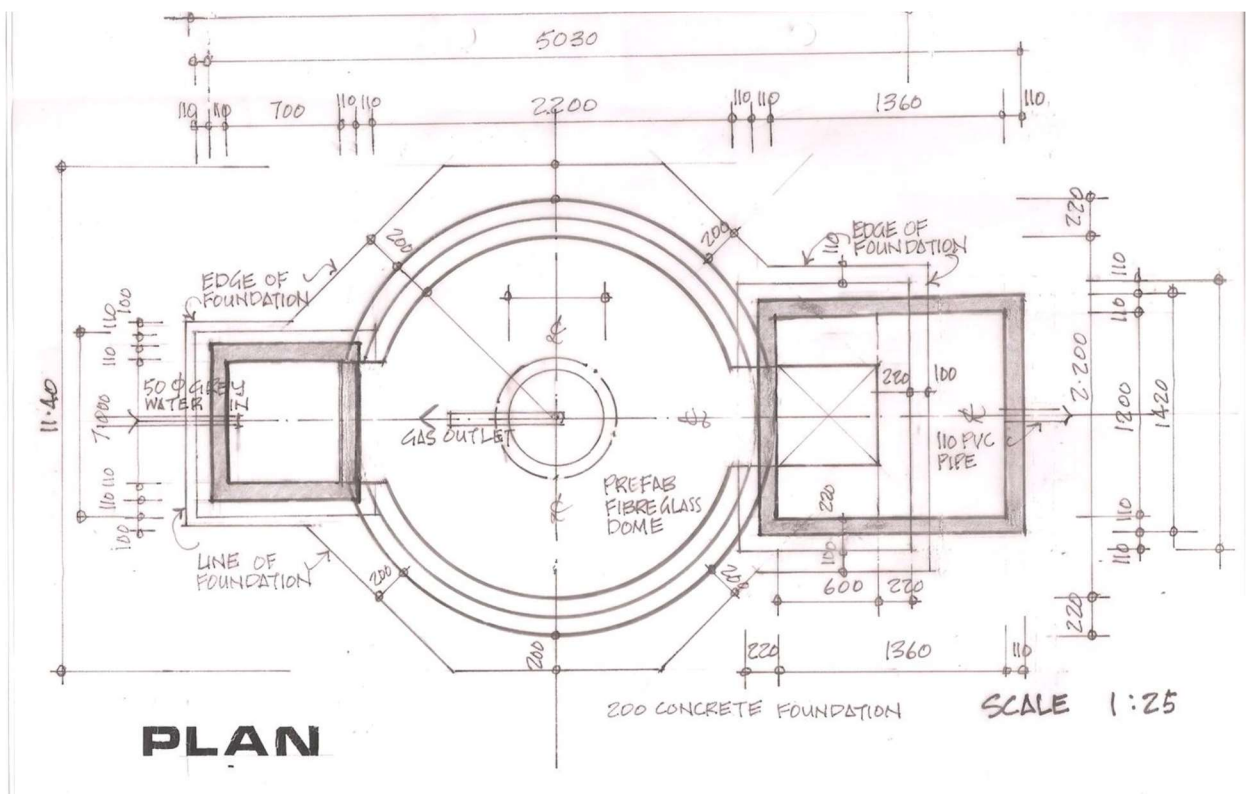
Original plan view drawing of digester (Khanyisa Projects, 2014)
